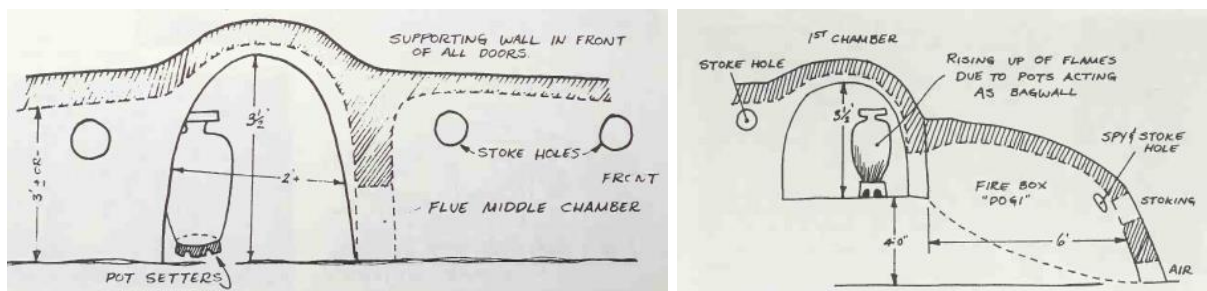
Kiln pipe Tamba (Japan Travel by NAVITIME, n.d.).
